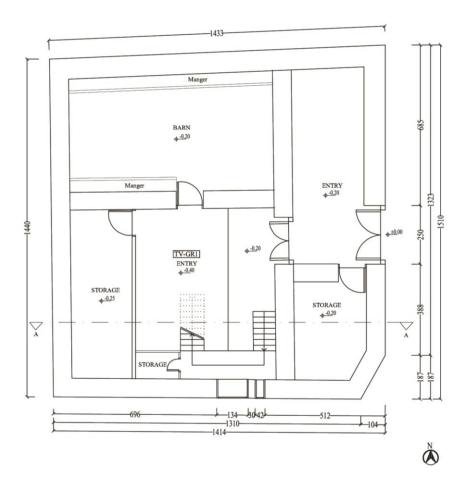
Ground floor plan of Tahtacıörencik Village House in 1/100 scale (Drawn by author).
